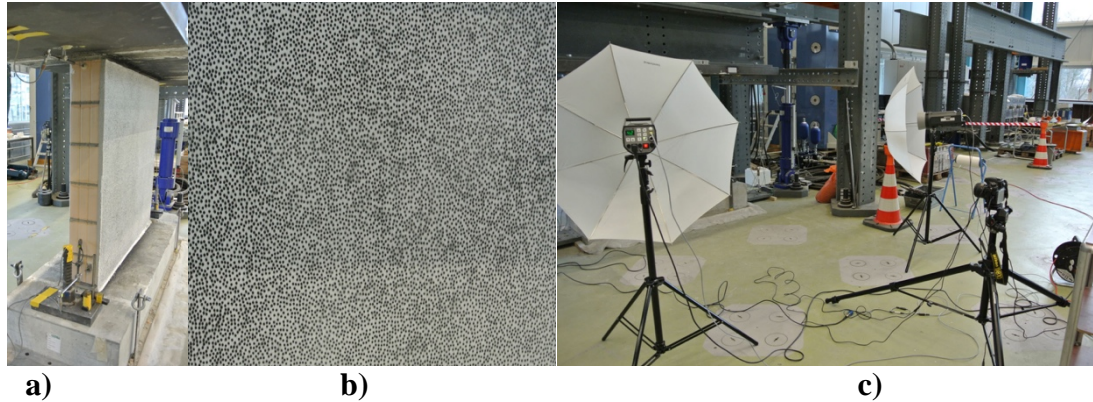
a) Plastered URM wall specimen, b) Random speckle pattern on plaster surface, c) DIC camera and flash setup
